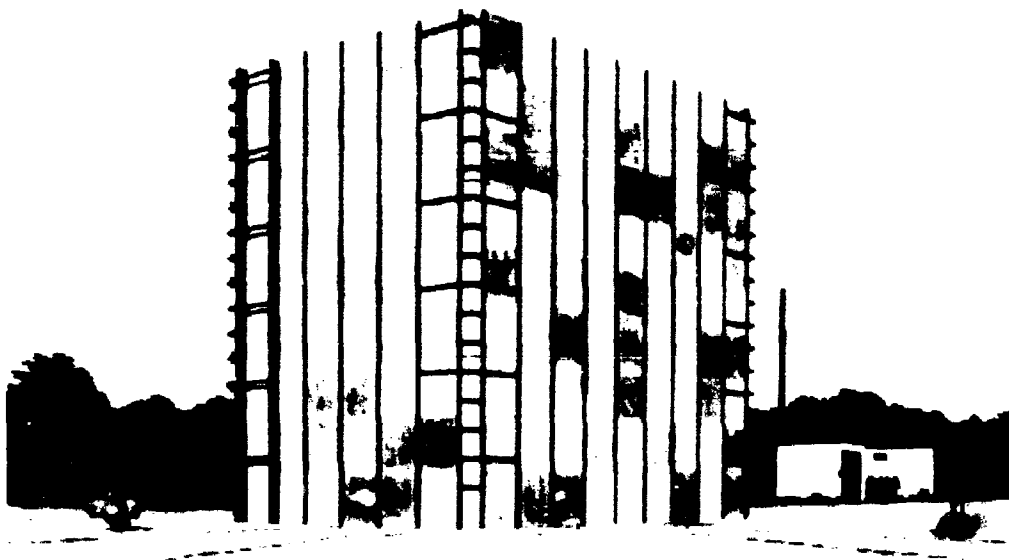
Test Structure Illustrating Placement of Wall Panels
